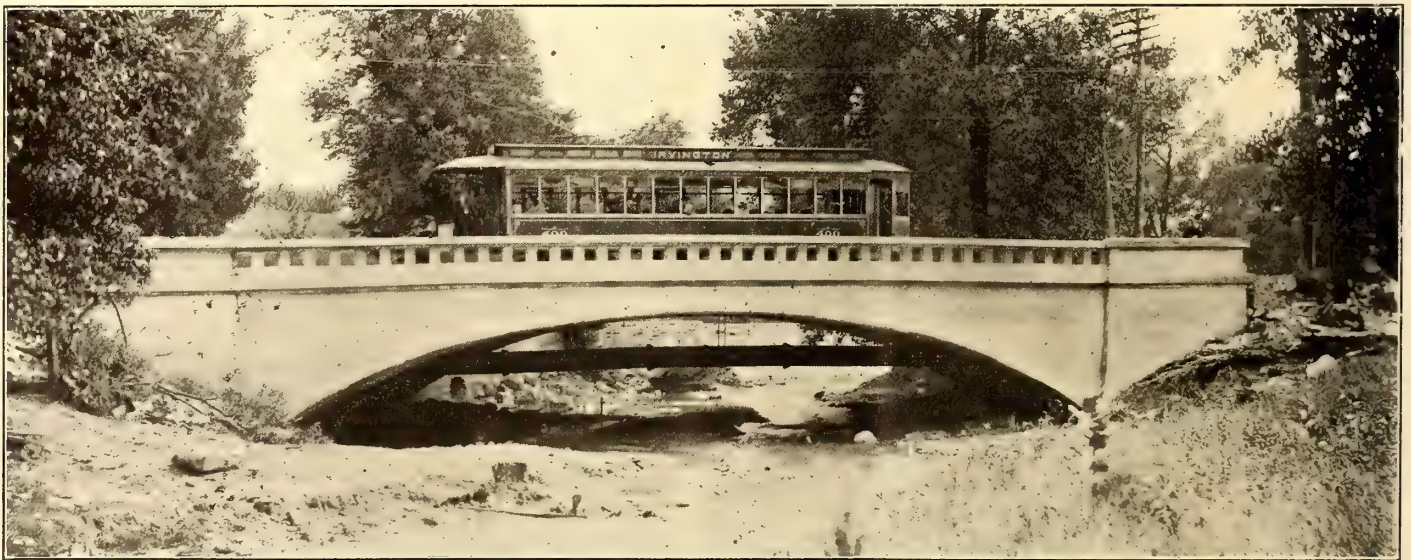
A 65-FT. CONCRETE ARCH ON EAST WASHINGTON STREET, INDIANAPOLIS
